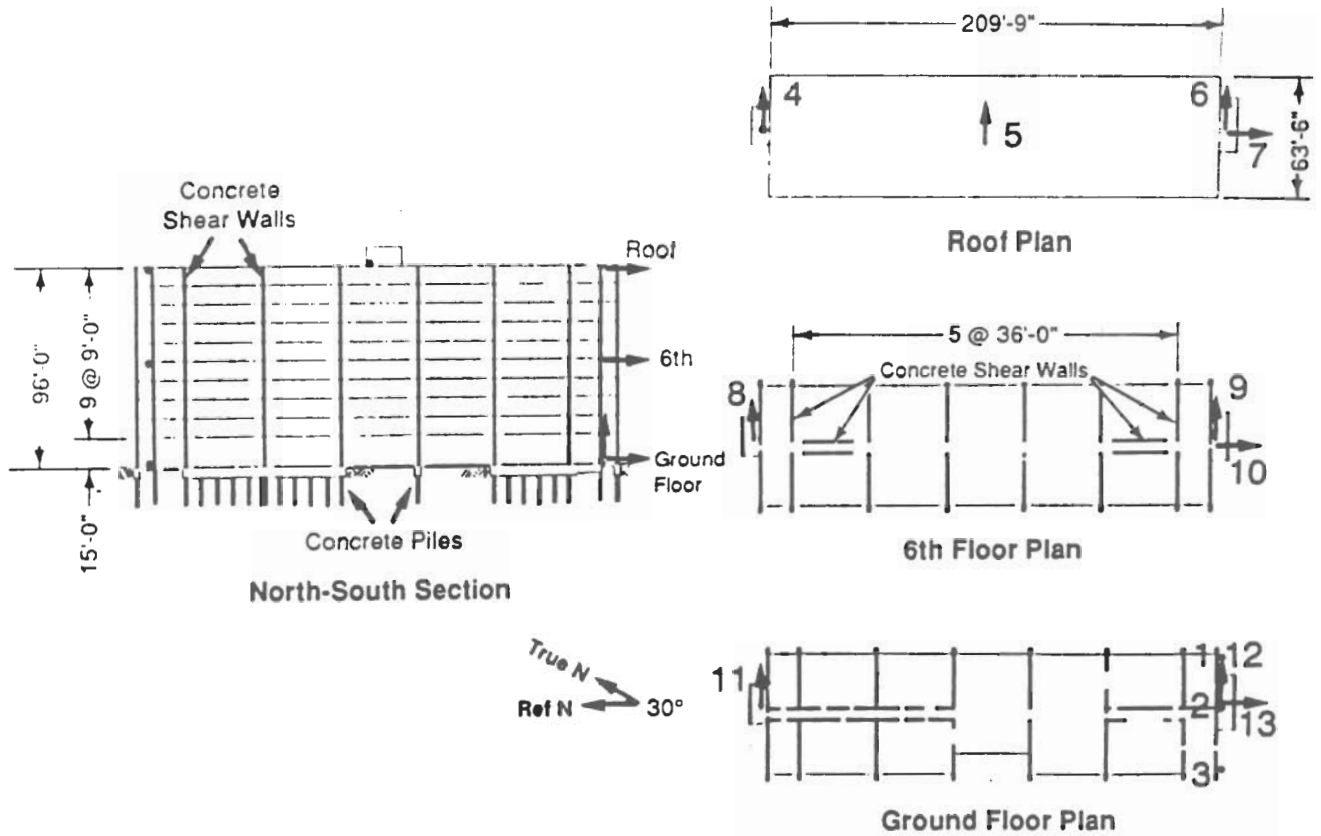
Building #2 - 10 Story Residential Building, San Jose
